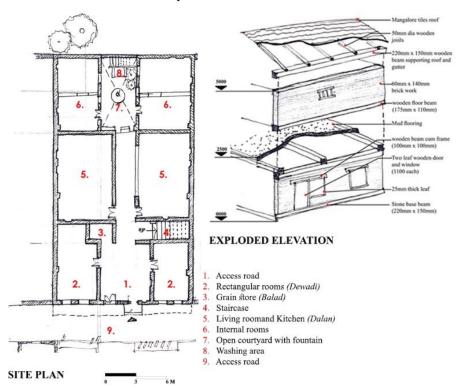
Case Example 1. Sathe Sadan, Kasba Peth: Plan and Exploded Elevation Showing the Materiality and Construction Details
